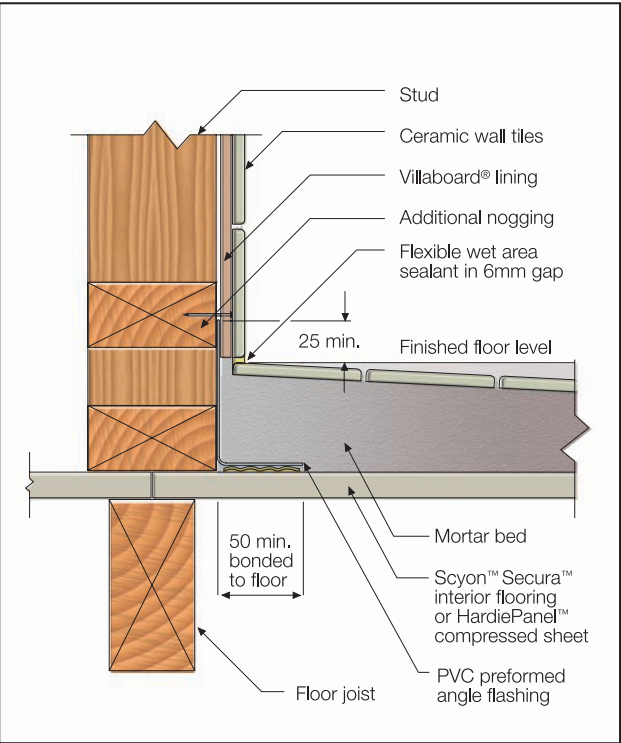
EXTERNAL PERIMETER FLASHING - VILLABOARD LININGS FINISHED WITH TILES
